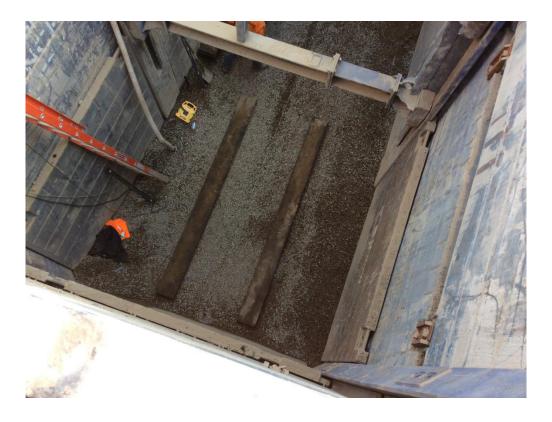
Section 4 Hydrotesting of a Prefabricated Installation
